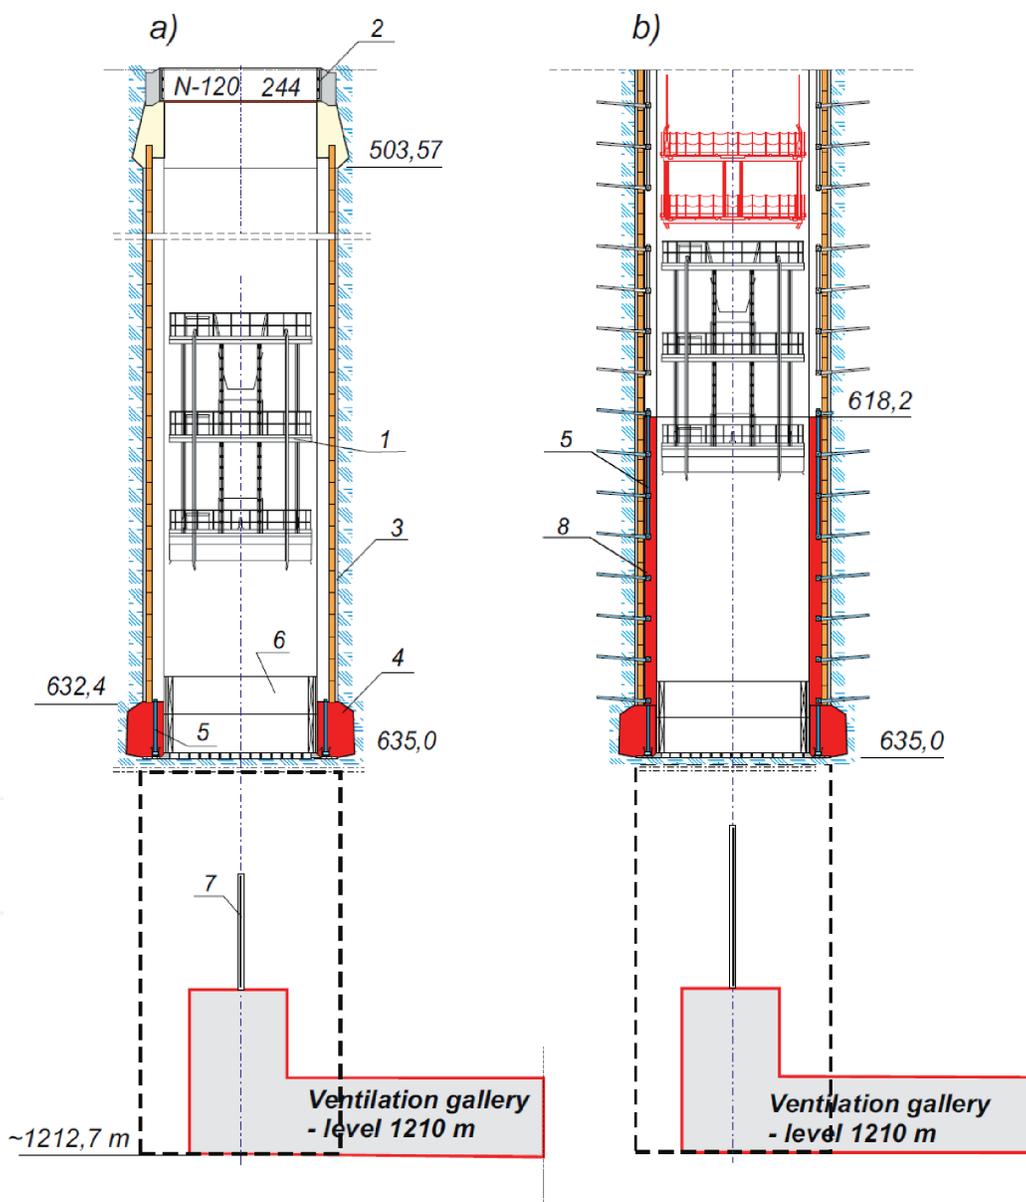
The last phases of shaft sinking in the frozen rock area. (a) Installation of foundation for the final shaft concrete lining. (b) Section of final shaft concrete lining with drainage. Explanations: 1, three-deck shaft working platform; 2, cast-iron shaft lining; 3, preliminary pre-cast segmental shaft lining; 4, shaft lining foundation; 5, boreholes in the drainage system; 6, sliding formwork $H = 3.75$ m; 7, dewatering borehole TS-1 ($d = 3.5$, $L = 576$ m); 8, final concrete lining.
